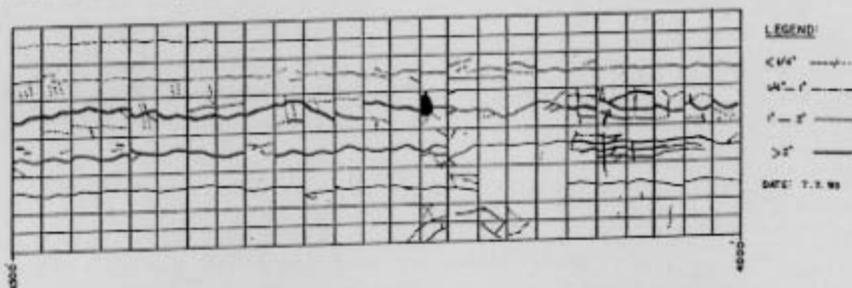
Cracked pavement between chainage 4000 and 4500 ft.
